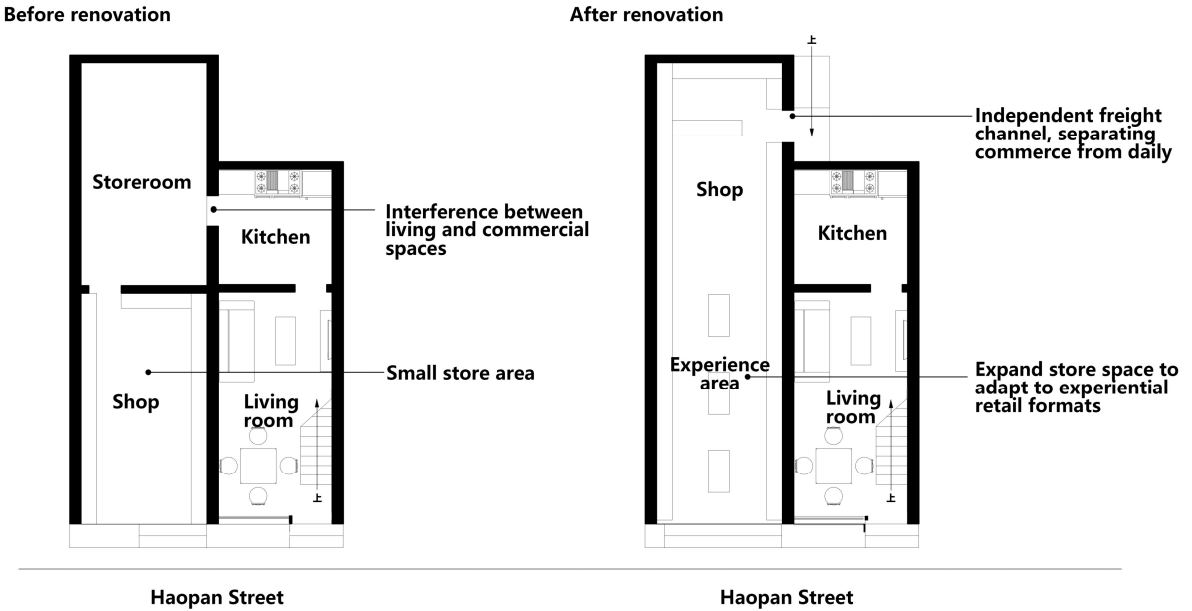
Street Node 2 Residential Building Pre - and Post Renovation Elevation
